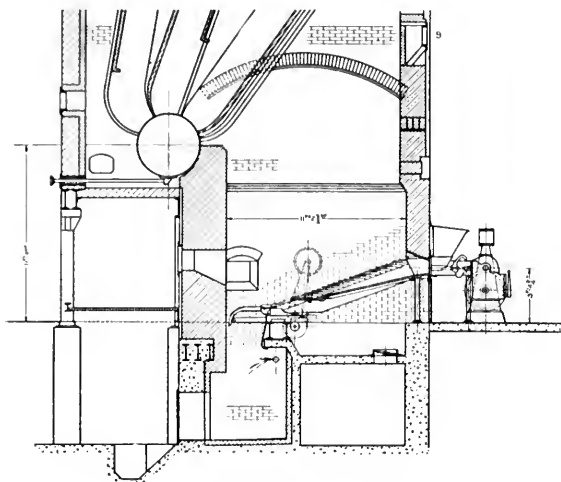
CROSS-SECTION OF FURNACE SETTING
